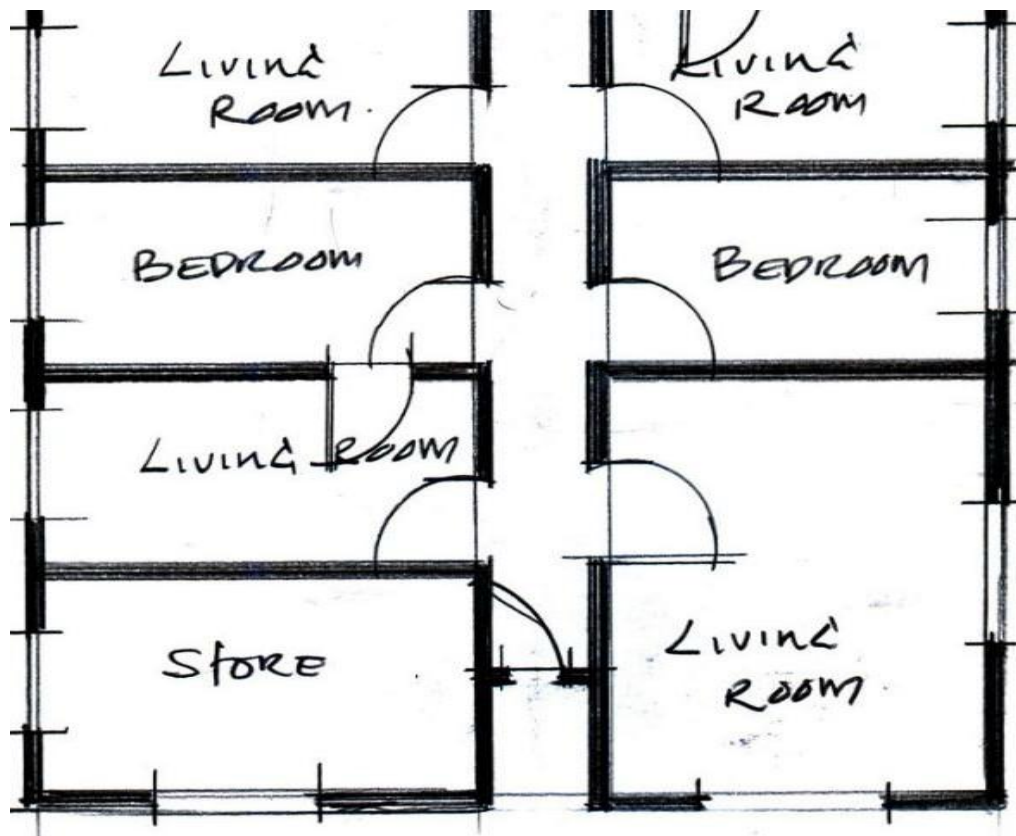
Floor plan of a typical corridor house-type (“face me i face you”)
